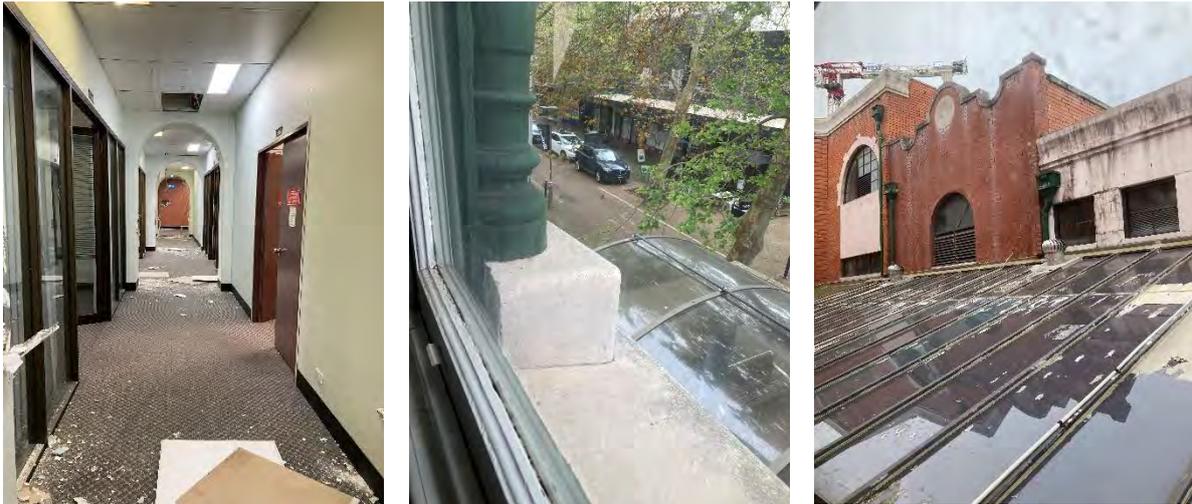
Internal views of the former Municipal building showing a central hallway (left), detail of a window facing Hunter Street (centre) and entrance leading to a later 1980s overpass extension (right).
